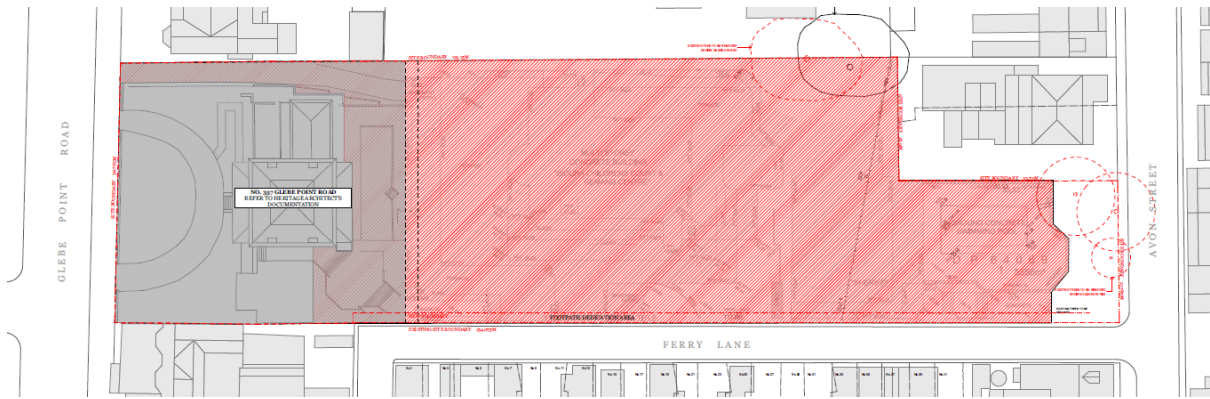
Proposed demolition plan (red shaded areas to be demolished)
